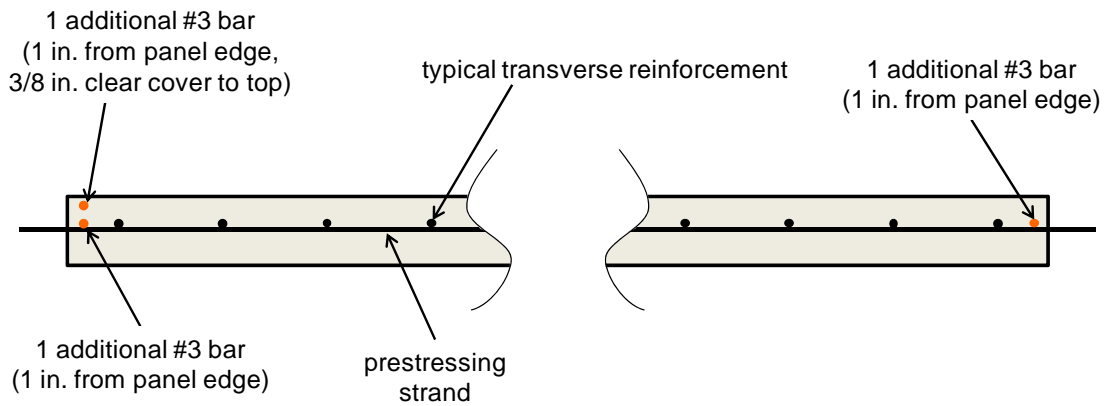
Section view of reinforcement layout in panels M1 and M2 (modifications shown in orange)
